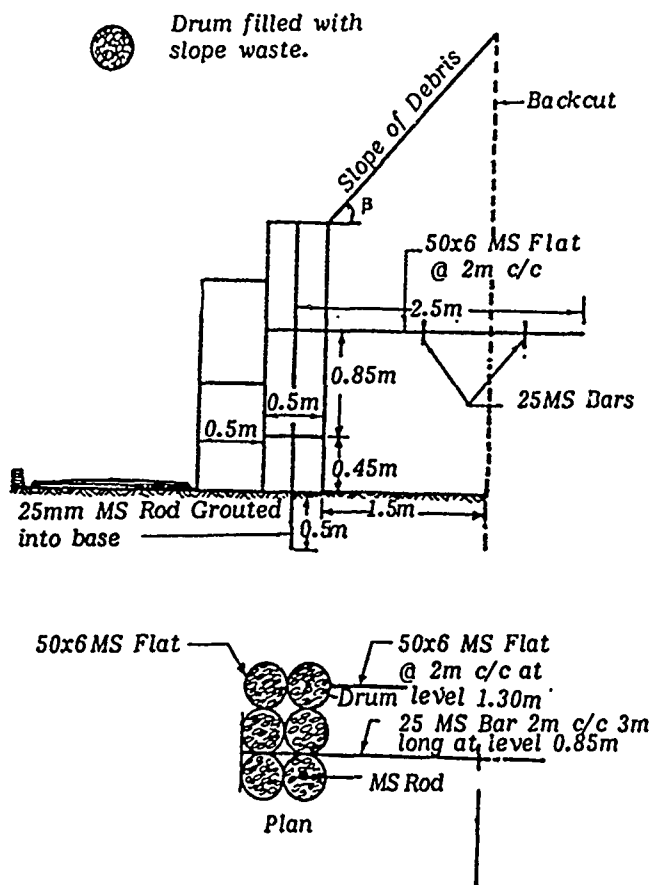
ANCHORED DRUM DIAPHRAGM WALL BUILT OF SLOPE WASTE AND EMPTY BITUMEN DRUMS
